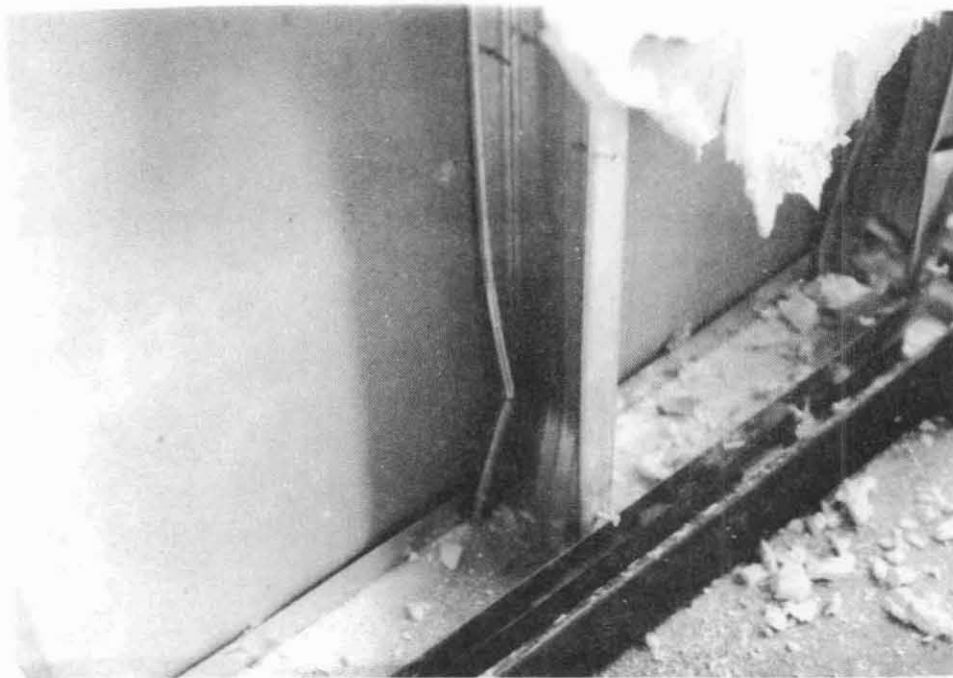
Partition Test Specimen P2A: Typical Stud Failure
